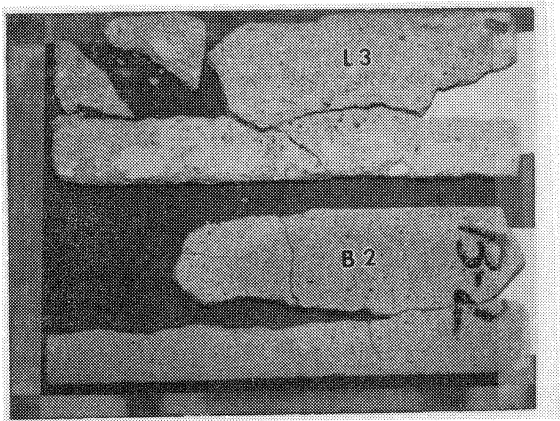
Examples of damage evident on mortar prisms. Surface spalling and interior cracking. Note pins on the end of prism, have fallen out in two samples.
